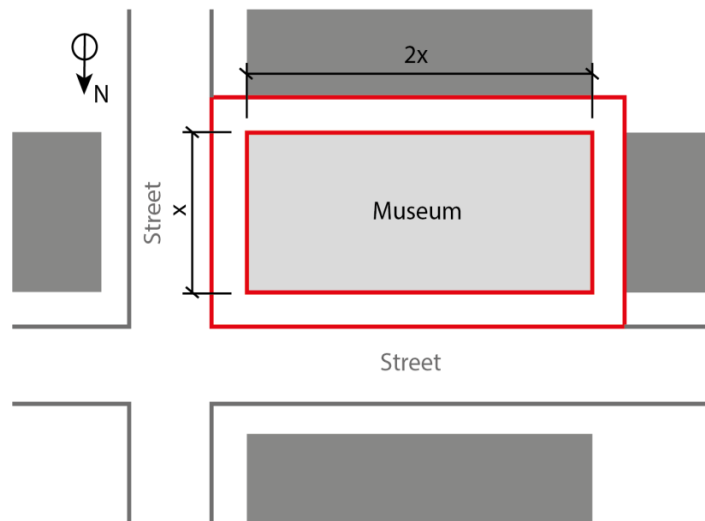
Geometric relationships in the floor plan for the created model (site and building's projection).
